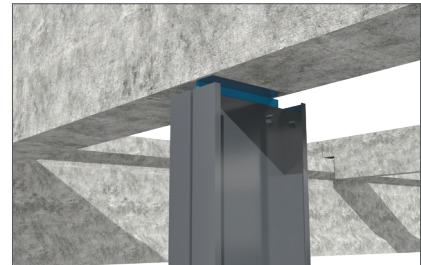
Detail of the column connection to the eaves beam, which is part of the primary concrete structure. The column is connected by means of an angle piece welded to a steel plate, which is included in the concrete purlin. Alternatively, this angle piece can be attached to the concrete purlin by means of chemical anchors or dowels. The column is connected to the angle piece with a pair of M16 bolts. Two pairs of M16 bolts can be used if necessary.
